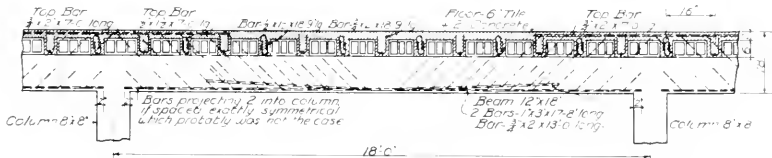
Detail of beam causing trouble through insufficient lap of reinforcement over support.
